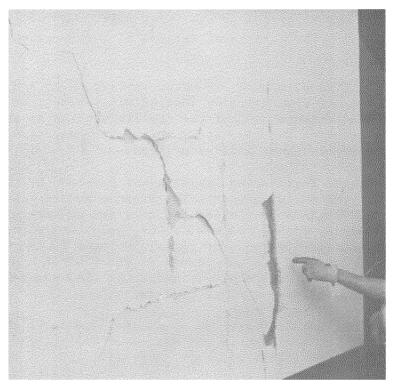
More diagonal cracks in north-south shear walls in first story of Anacapa Residence Hall.
